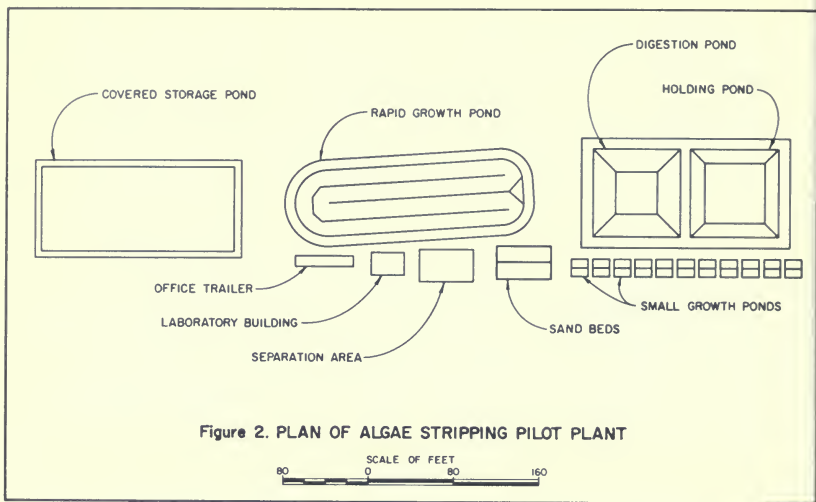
PLAN OF ALGAE STRIPPING PILOT PLANT
